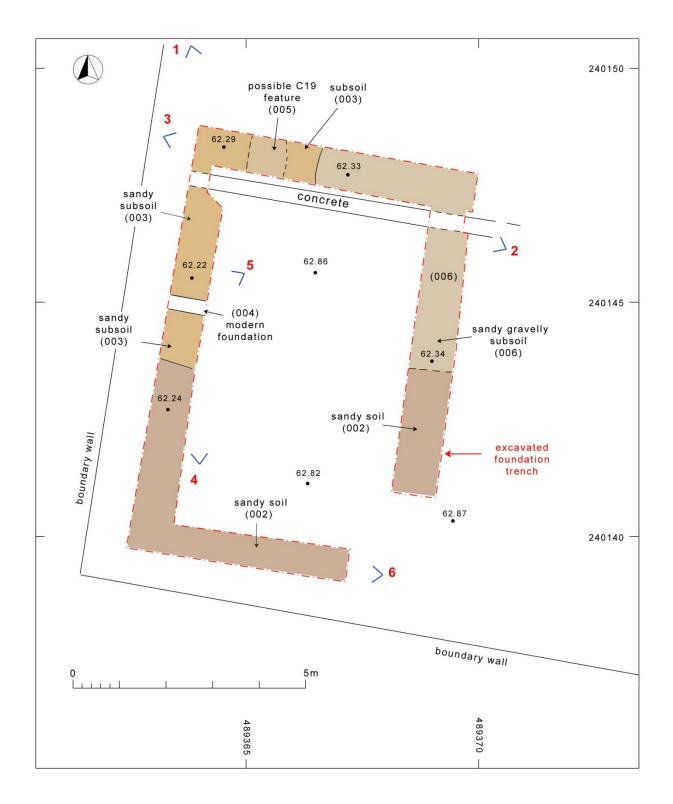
Plan of excavated foundation trenches, showing the nature of exposed deposits, levels (OD m) and direction of photos 1 to 6
